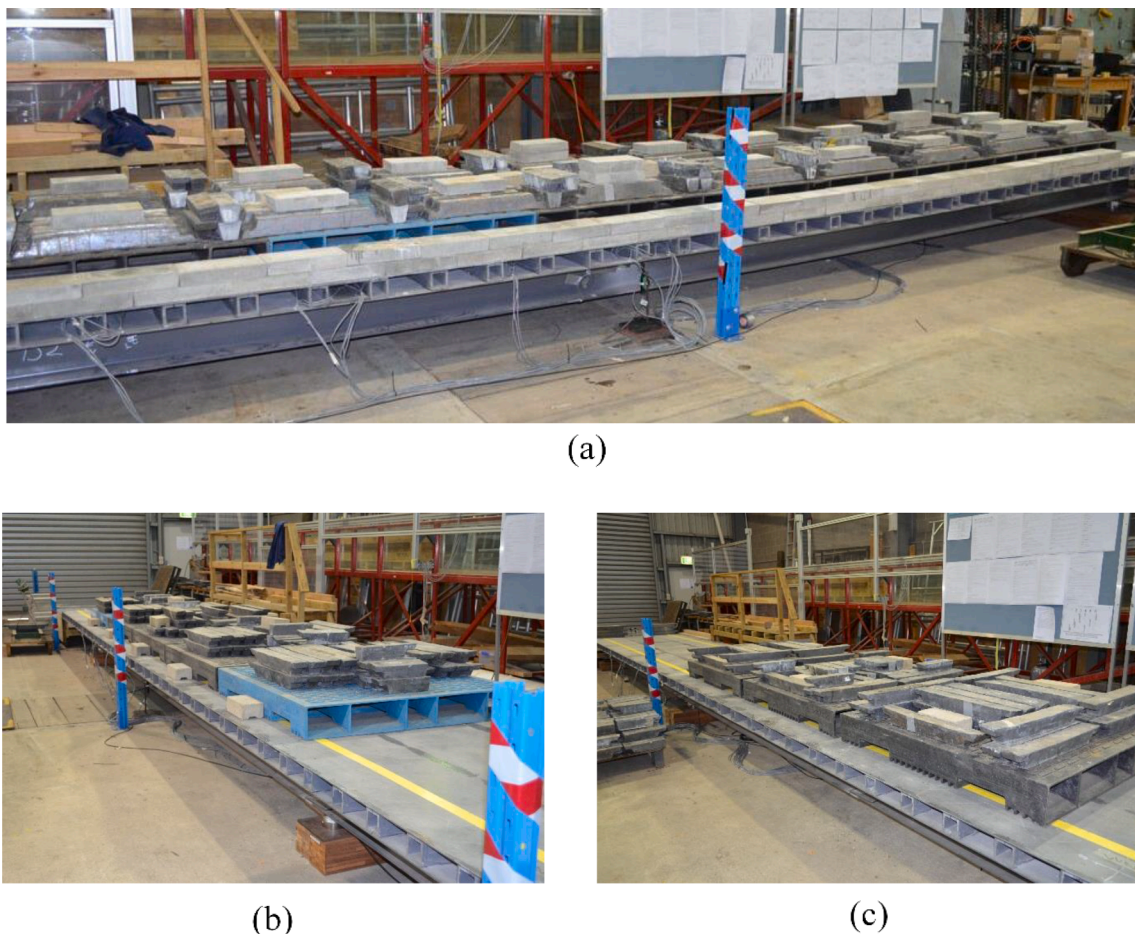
Static Tests: (a) Test 1 – 9 m single-span, (b) Test 2 – 6 m single-span, and (c) Test 3 – 4.39 m two-span.
